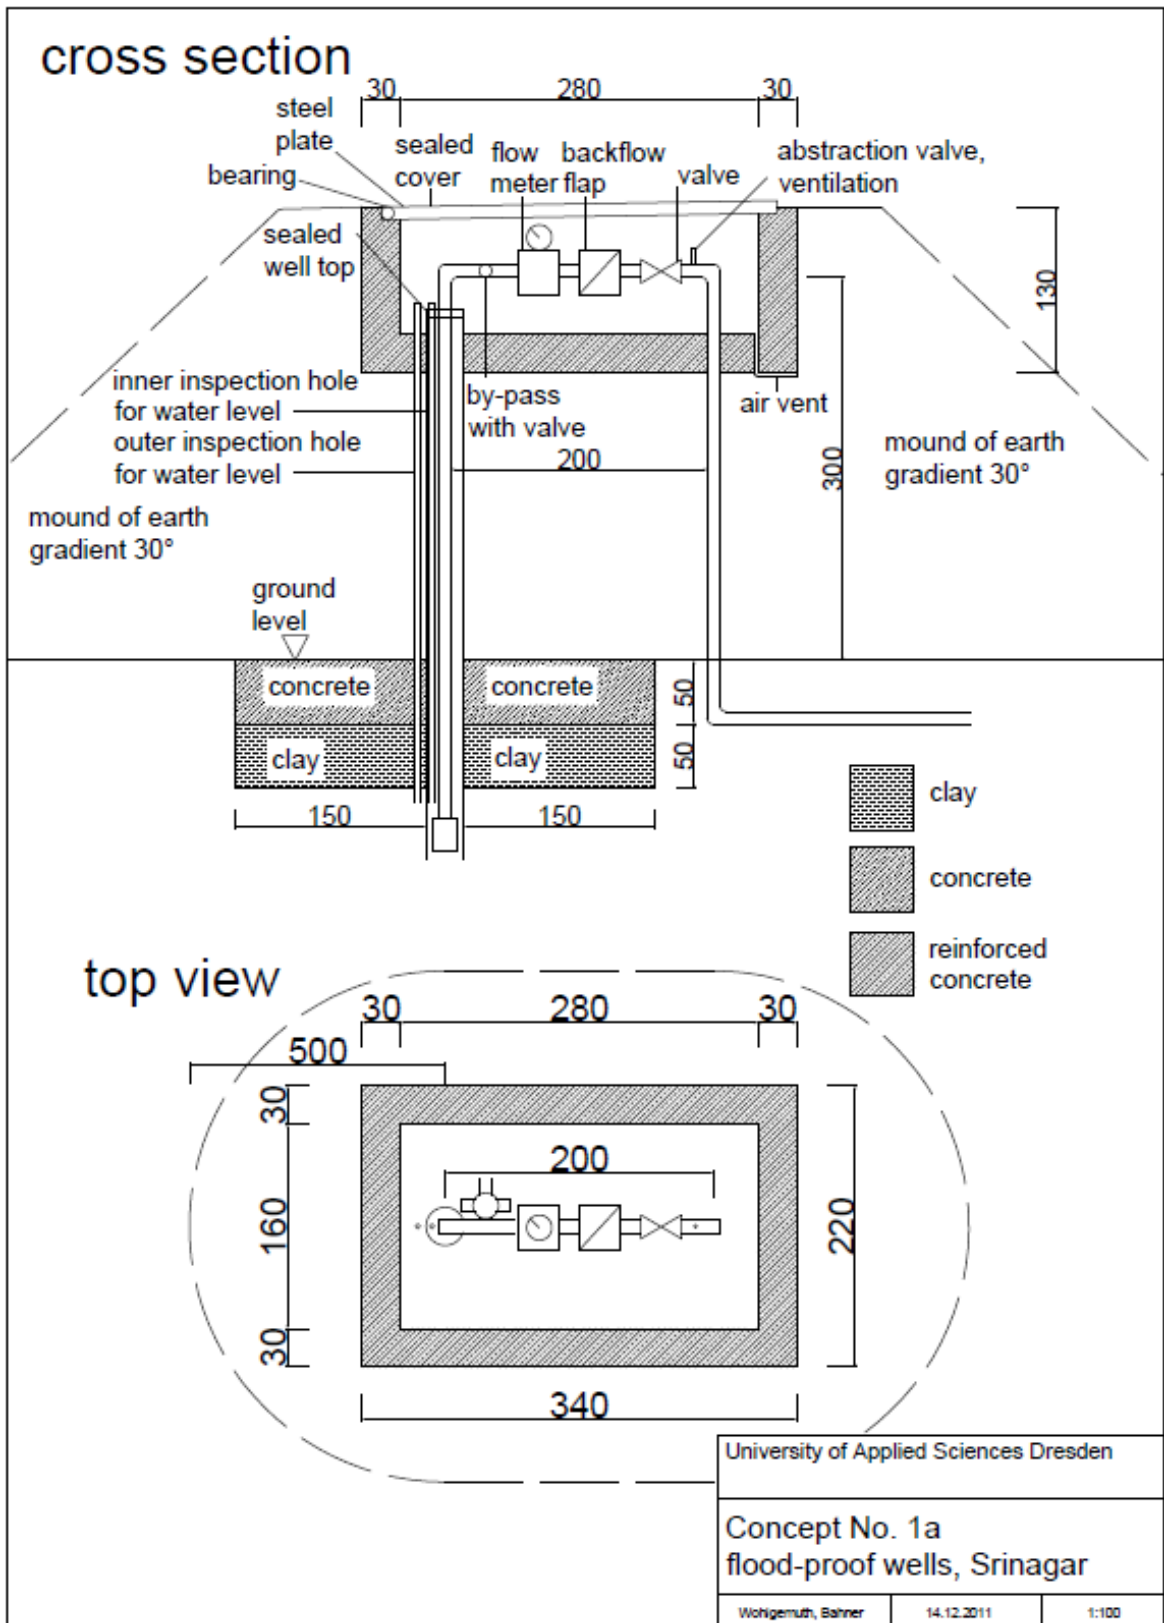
Design 1 - Cement-concrete well-head chamber built on elevated mound (Saph Pani, 2013)
